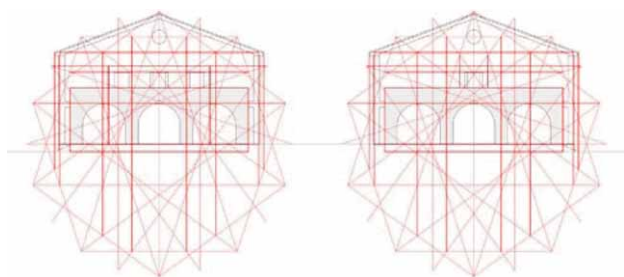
The pentagonal, or icosagonal, interpretation of the layout of the facade with porches given in the floor plan in Figure 3. In this way all structural elements can be analysed and defined through their interdependent relationship; the height of the facility, the height and width of the porches, the sizes of all openings, arches, the axial position, etc. It is quite obvious that the author-architect did not improvise, but based his creation firmly on his excellent knowledge of the principles of classical architecture. Drawing by I. Juretić.
